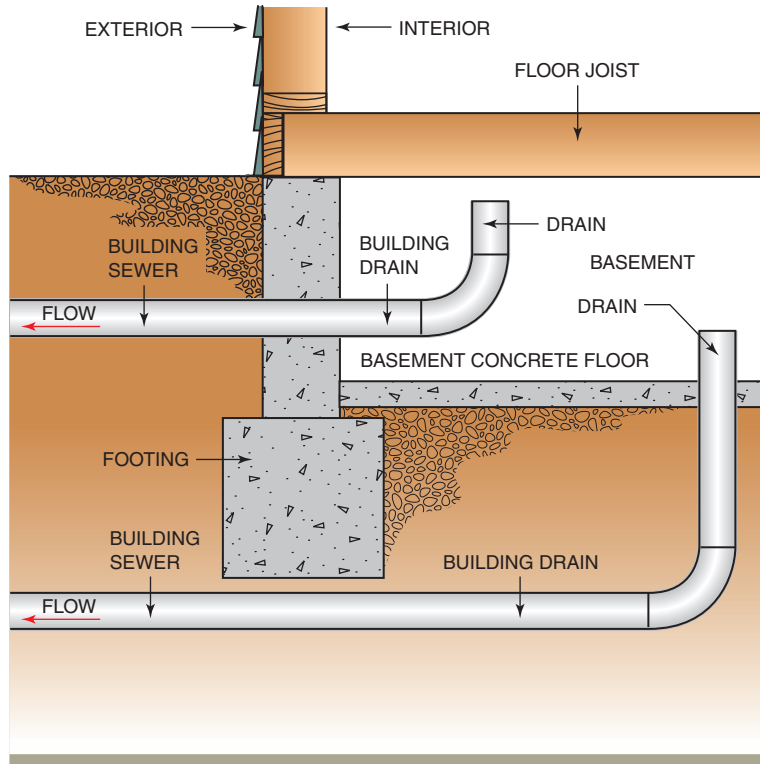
Piping exiting a basement is either through the foundation wall or below the concrete floor.
